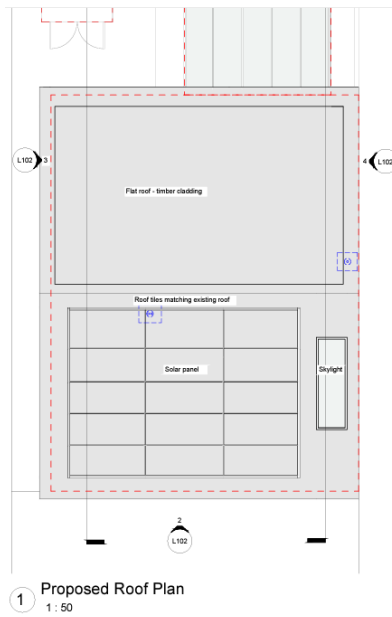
Proposed Roof Plan for 94 Temple Sheen Road with removal of chimneys, new box dormer to rear roof slope, and new solar panels and rooflight to front roof slope
